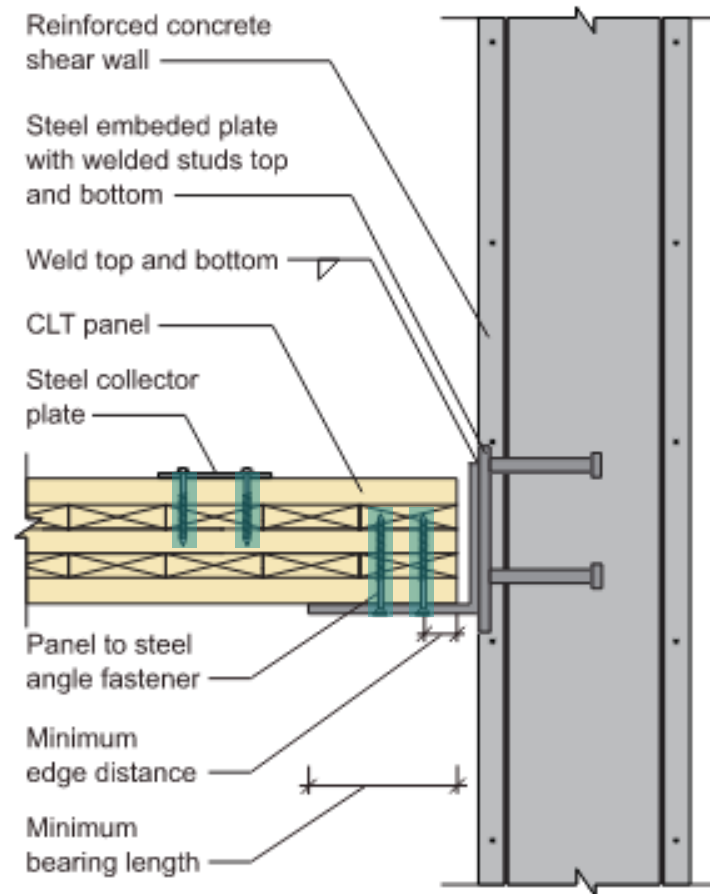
Collector load path to concrete shear wall through CLT panel
